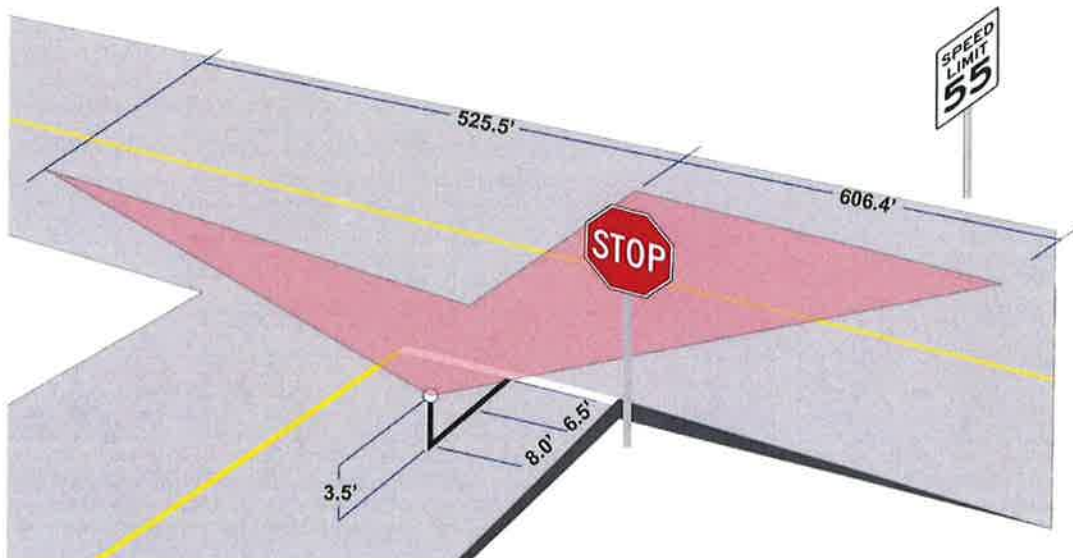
AASHTO minimum recommended intersection sight distance dimensions at the private Parrish Lane driveways.
